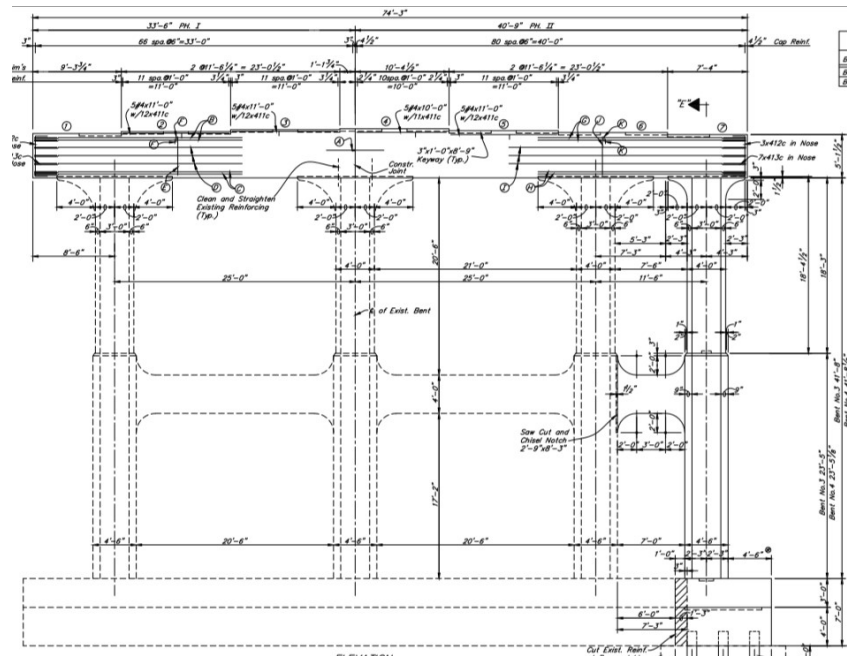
Transverse Elevation of Interior Pier 3 (NBI 18790) (2014)
